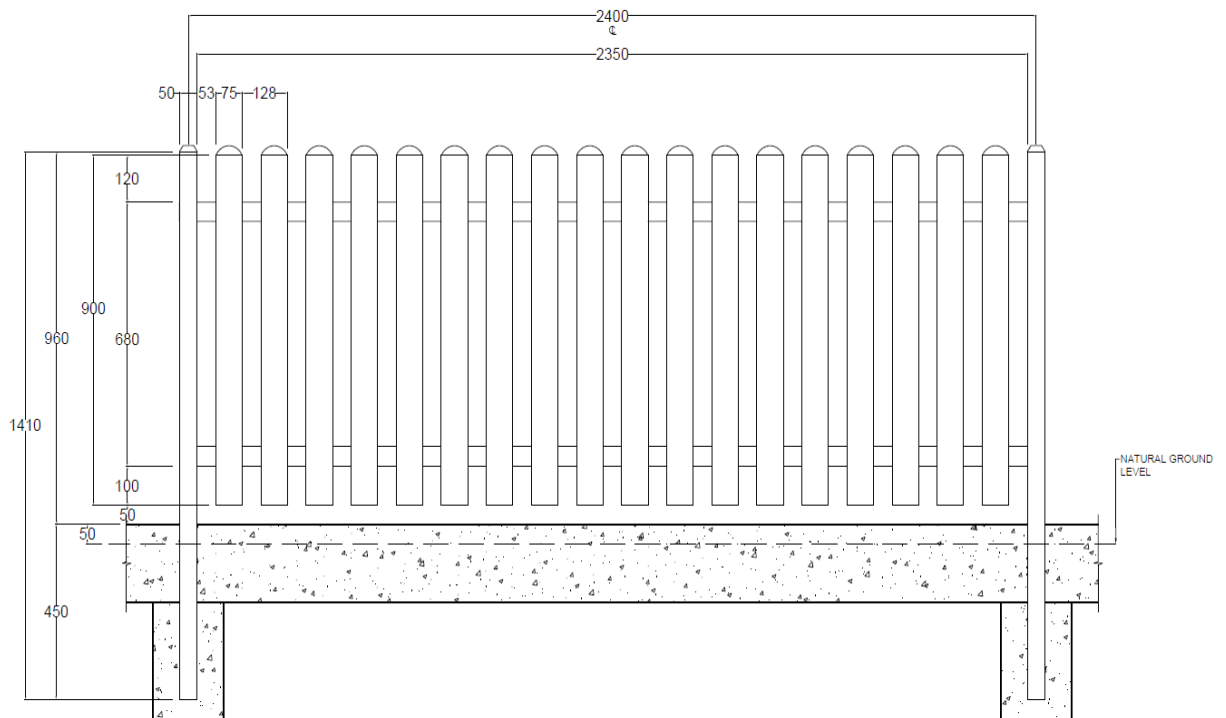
Indicative elevation of the proposed picket oval fencing (cast alloy system)
